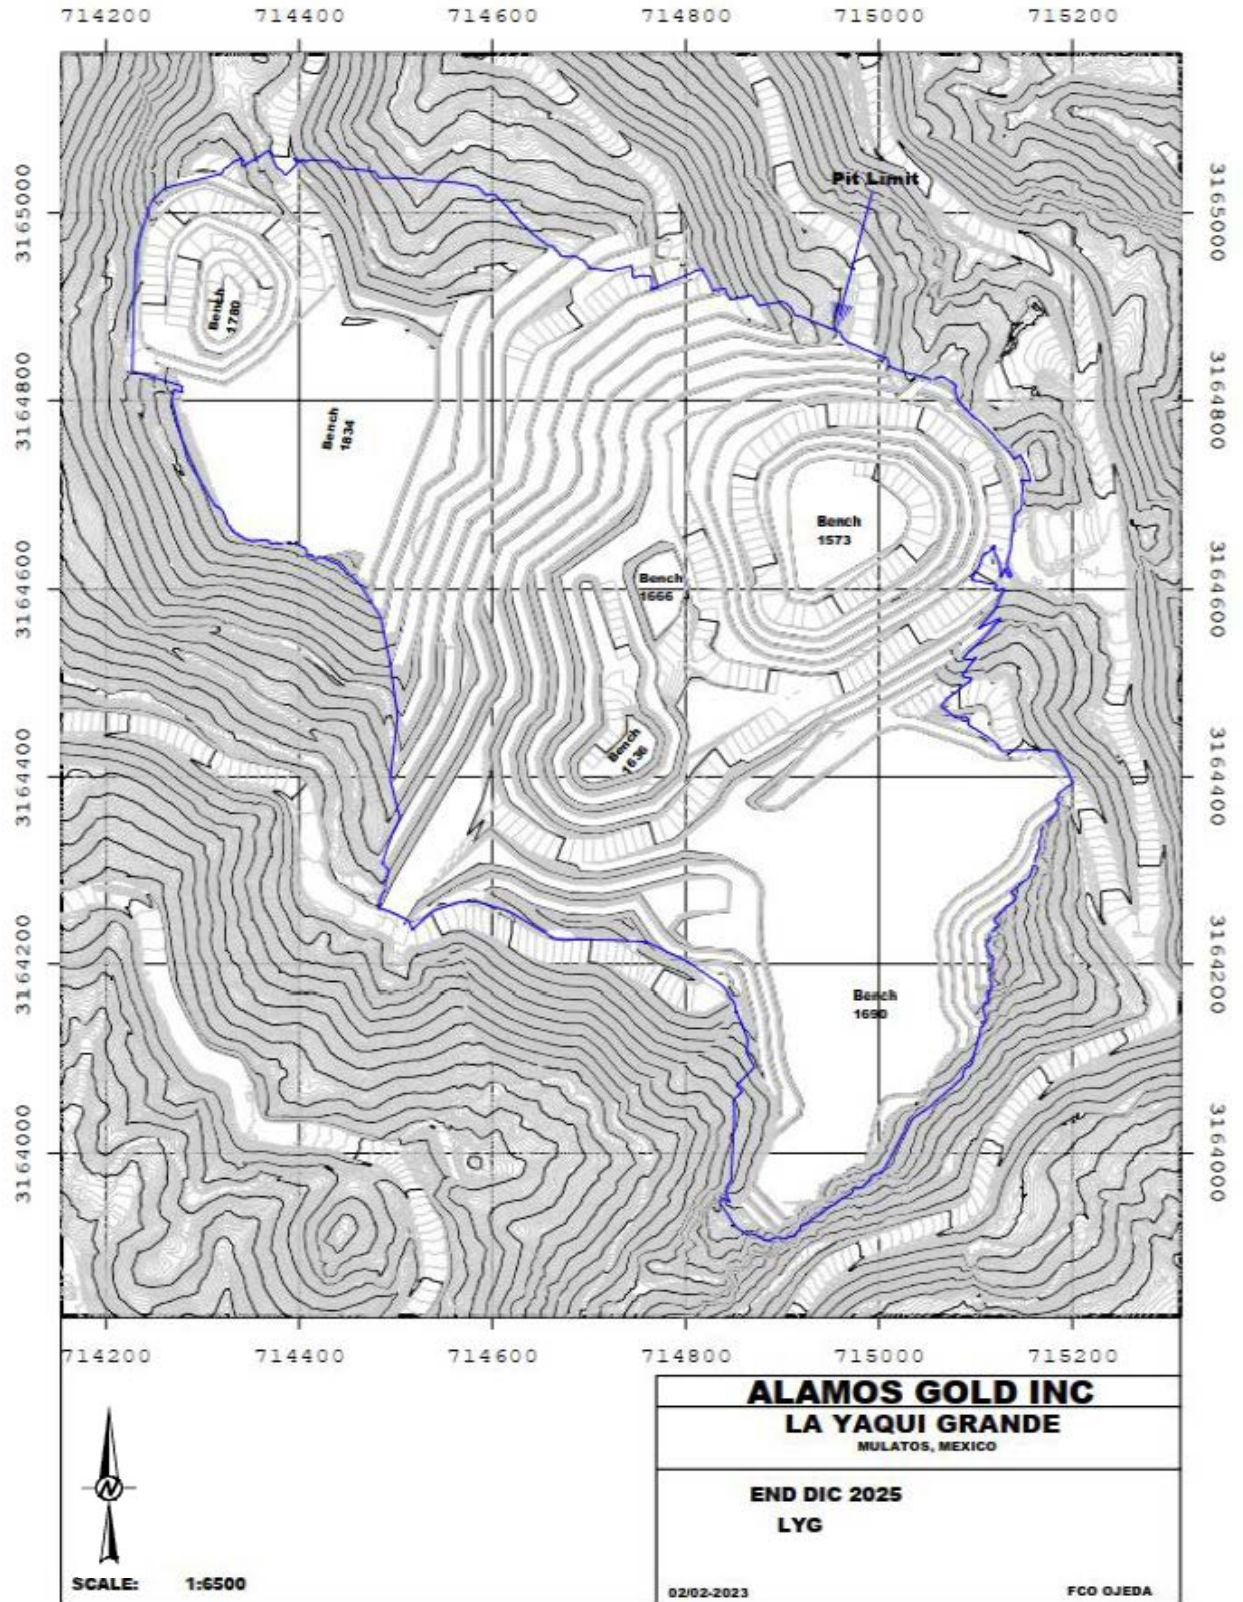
La Yaqui Grande Pit Plan, End of 2025
